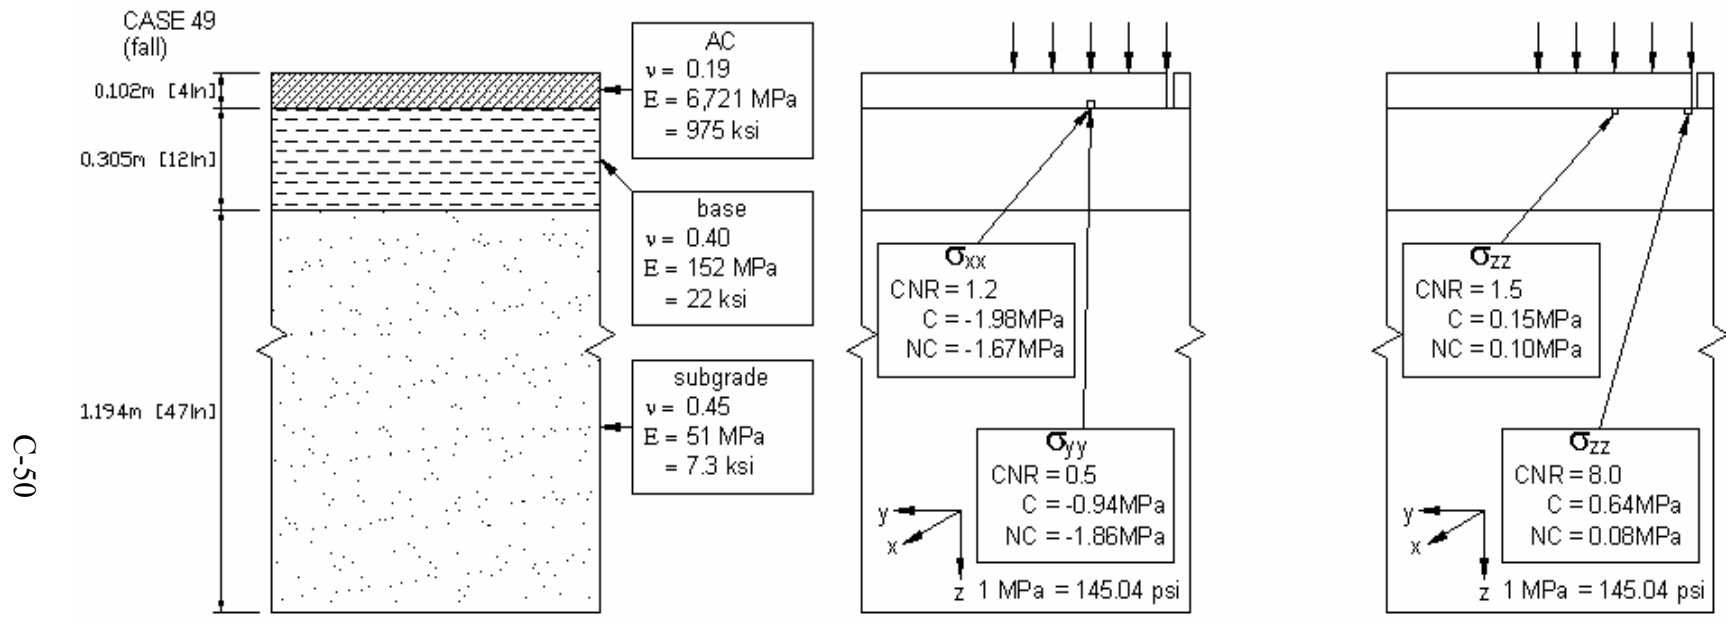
Summary cross section for case 49, (C – stress in cracked pavement, NC – stress in pavement with no crack, CNR – crack/no crack (stress) ratio)
